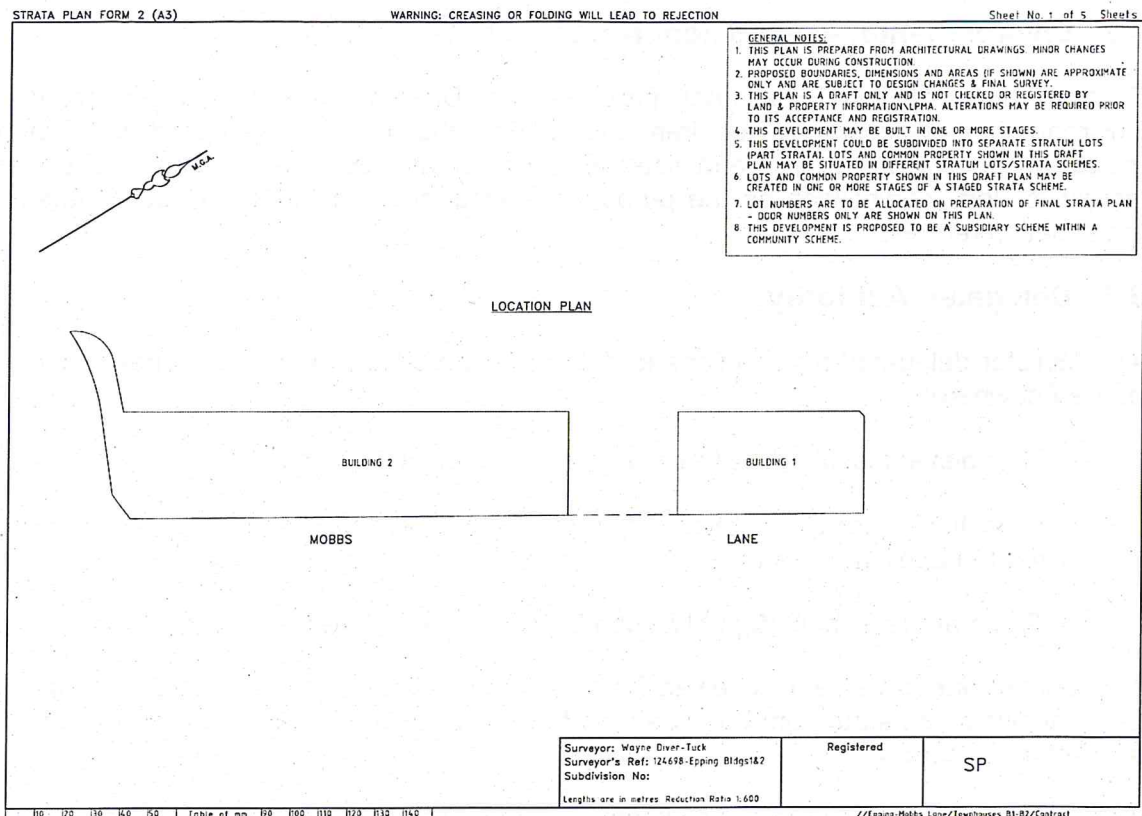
Corresponding strata plan identifying Buildings 1 and 2.
